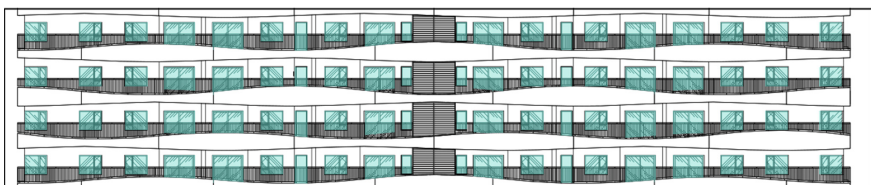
Doors and windows of a typical apartment in DLRS (*Source* authors)
